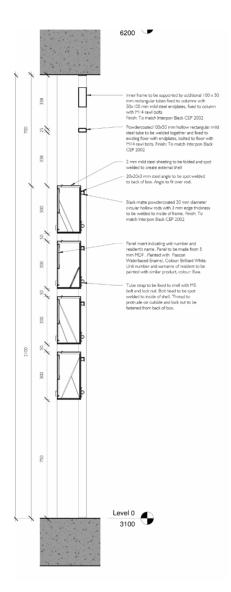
Section A-A of postbox bay, not to scale (by Author)
